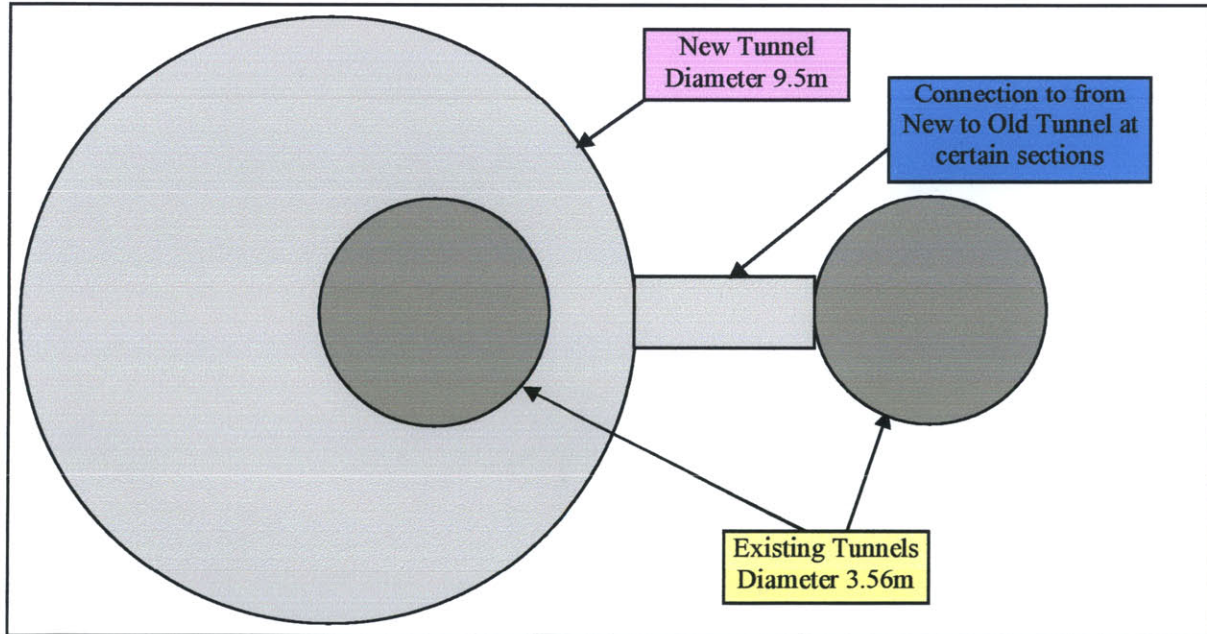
Re-boring scheme for New Tunnels over Existing Tunnels
